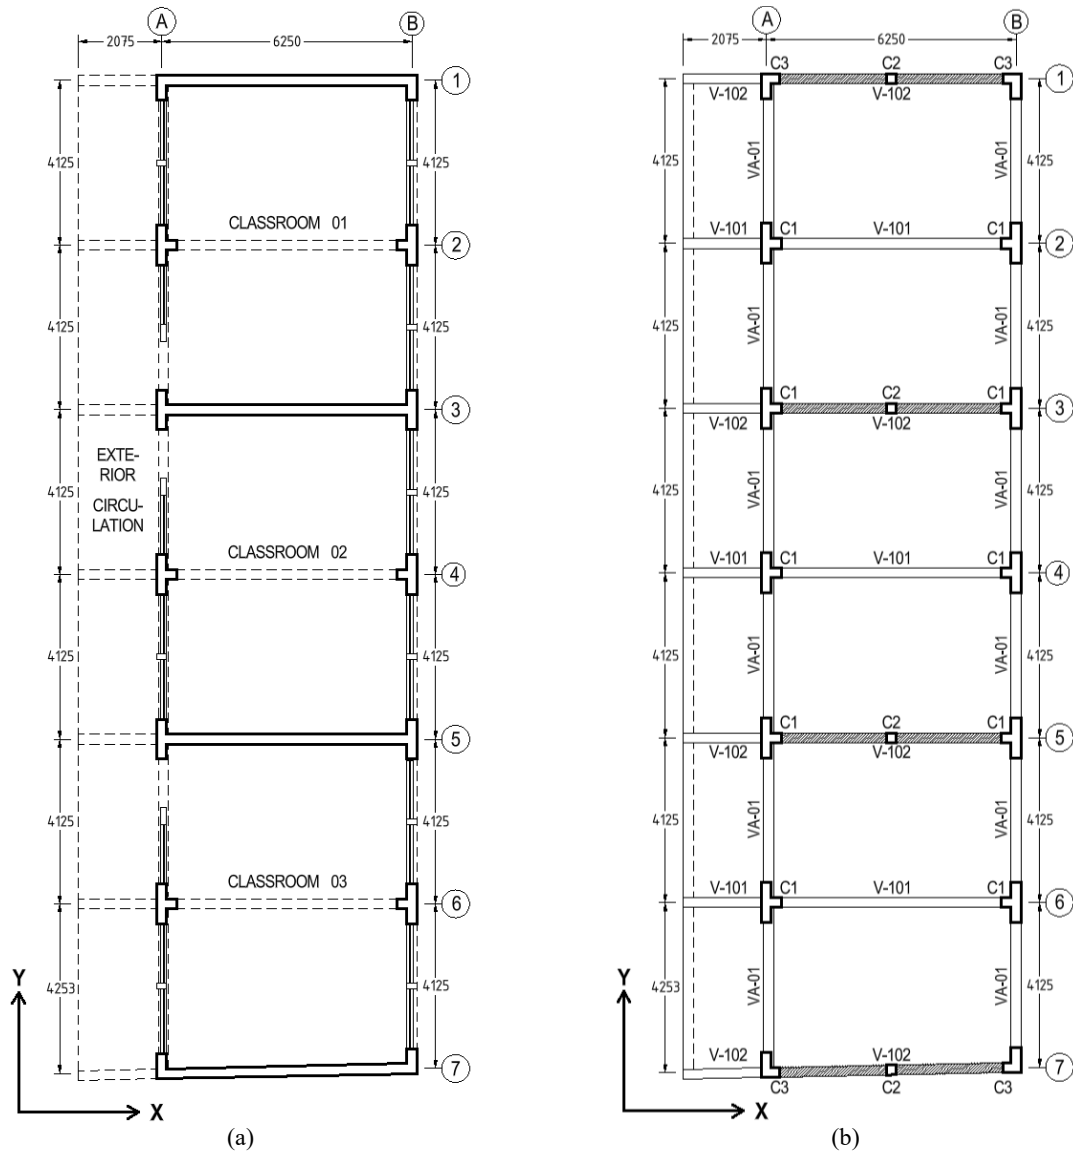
(a) Architectural floor plan, and (b) structural framing plan of the school building under study
